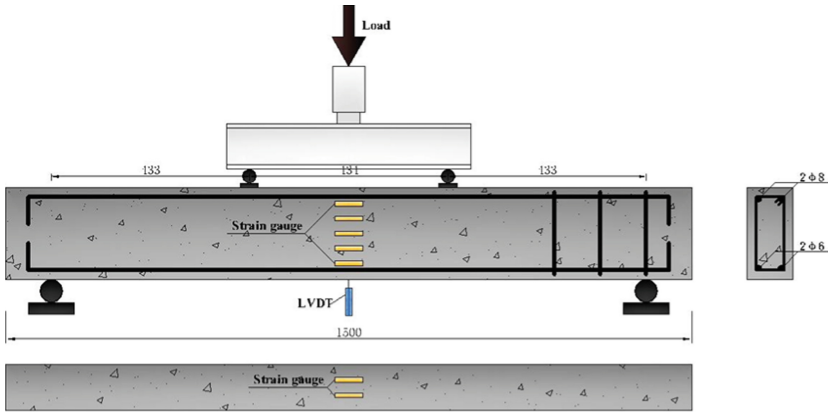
Testing scheme of the RC beam with cross-sectional details (all units in mm).
